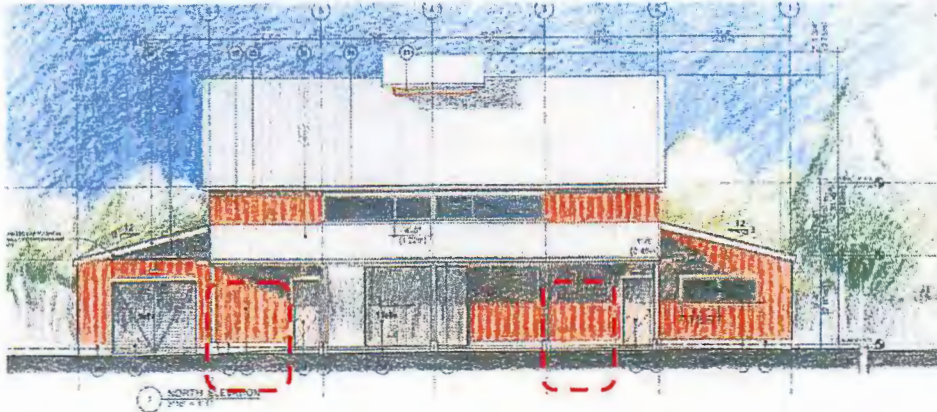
North elevation of barn, showing exterior wall locations for artwork.
